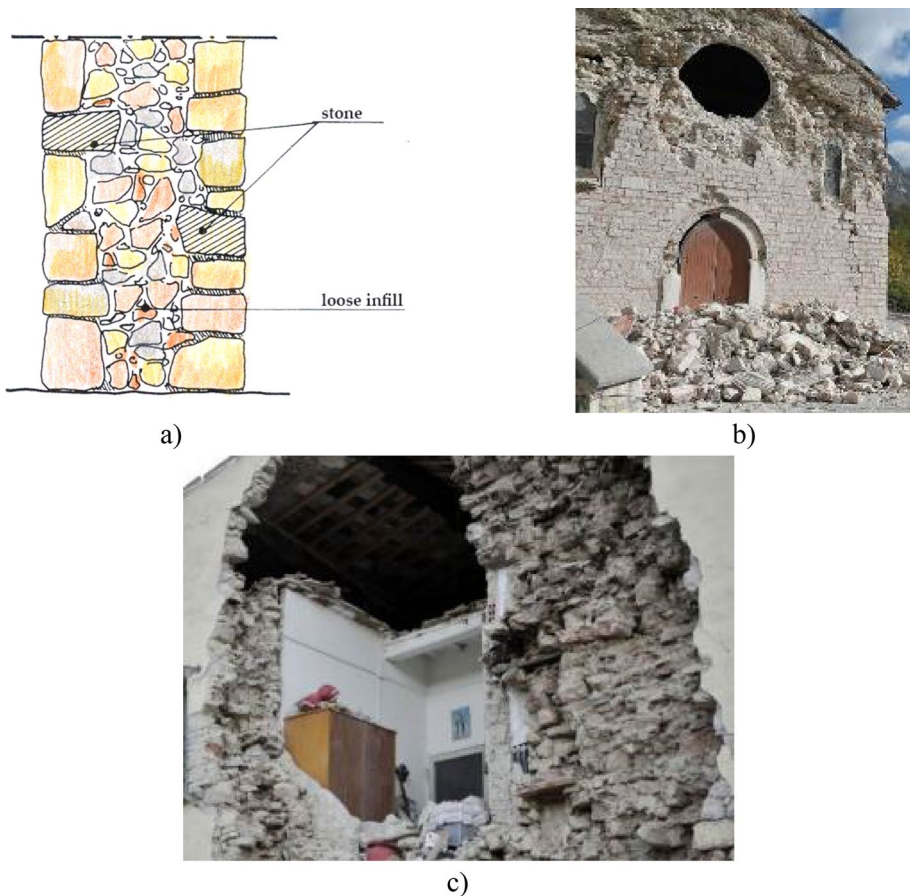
a Example of three-leaf masonry wall cross section; collapse of the three-leaf façade (following the 2016 Central Italy Earthquake) of: b the Santa Maria Assunta Church in Ussita and; c a residential building in Visso
